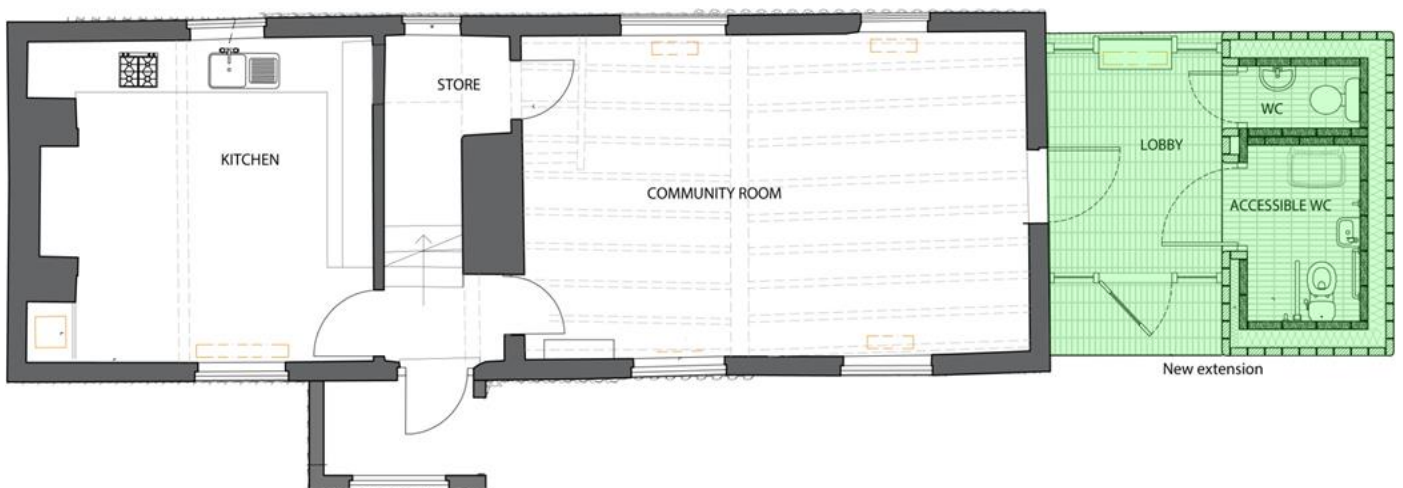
Plan of the lower ground floor of Church Cottage with the new extension highlighted in green, courtesy of Ferrey and Mennim Ltd.
